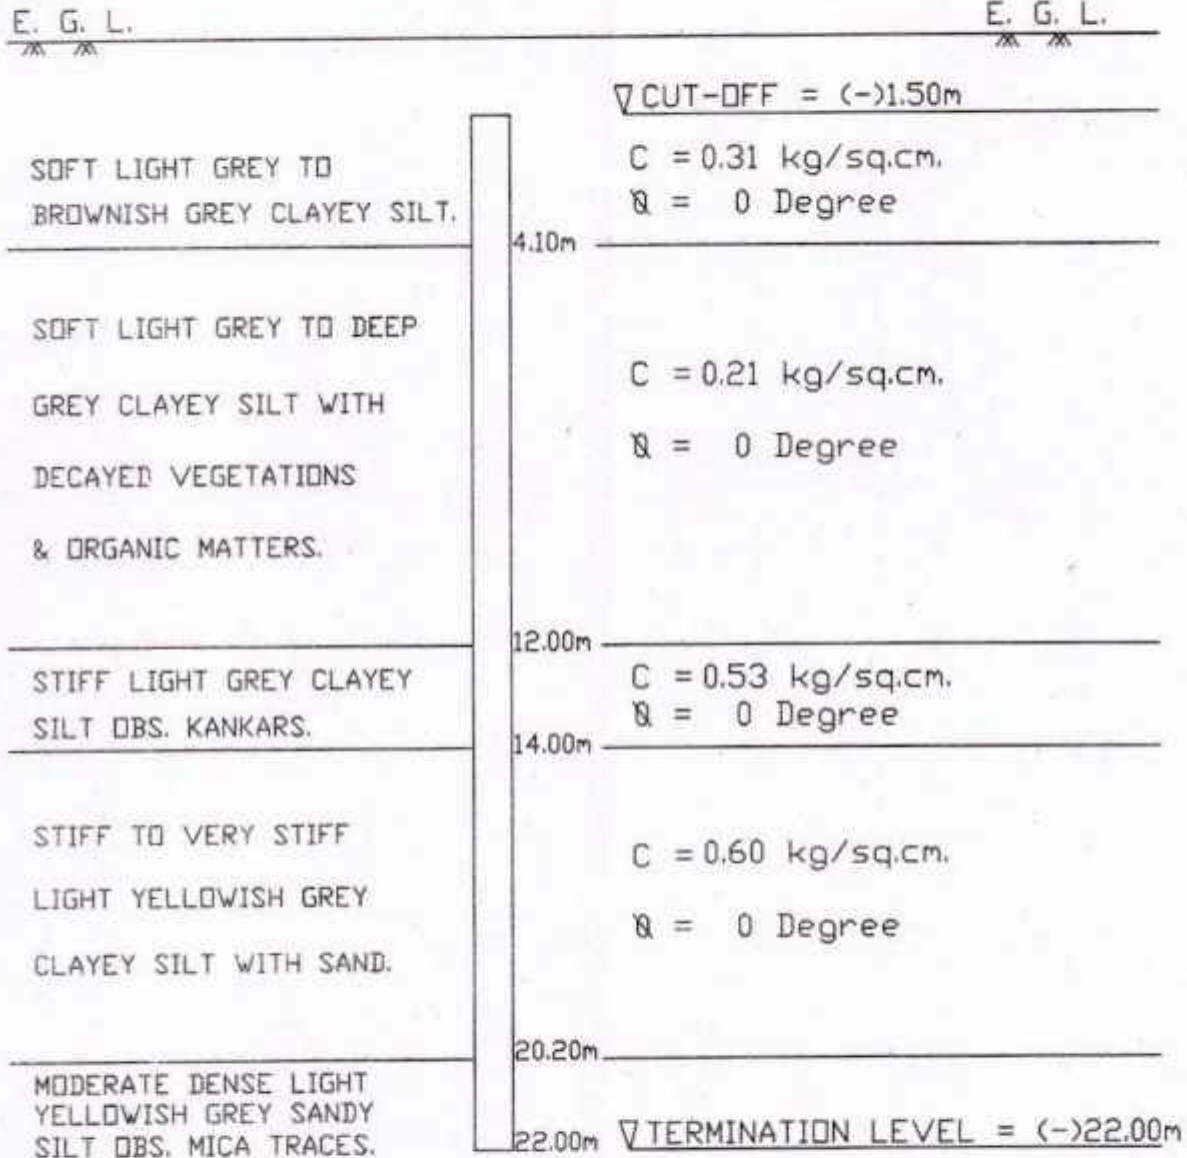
FOUNDATION DESIGN MODEL FOR DEEP FOUNDATIONS
